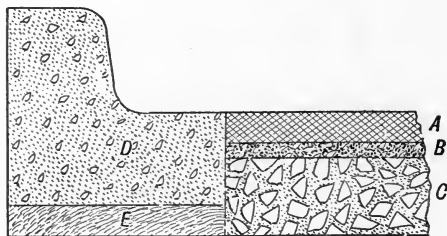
Cross-section of a Sheet Asphalt Pavement.
